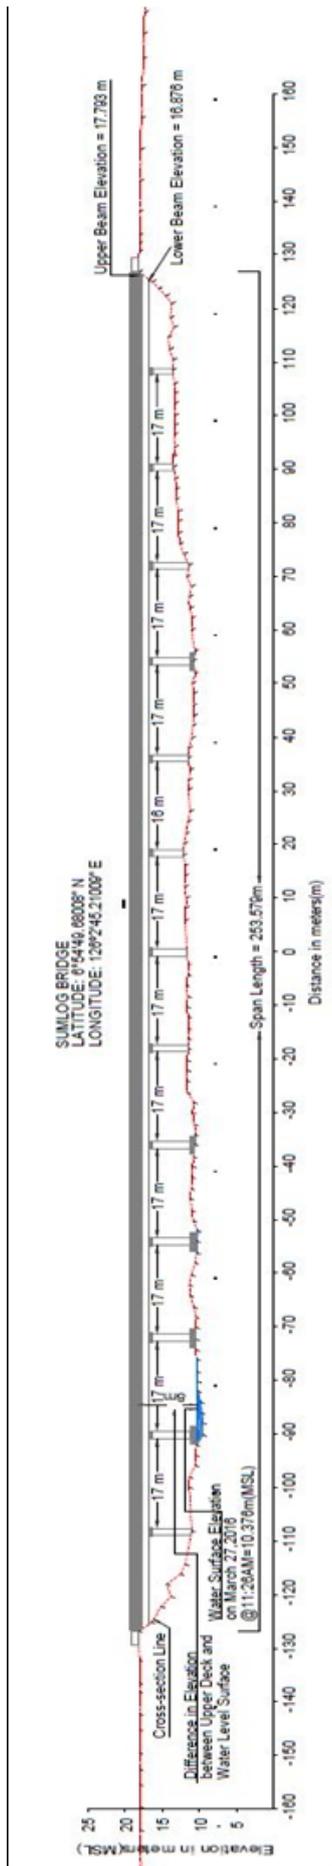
The Sumlog Bridge cross-section survey drawn to scale.
